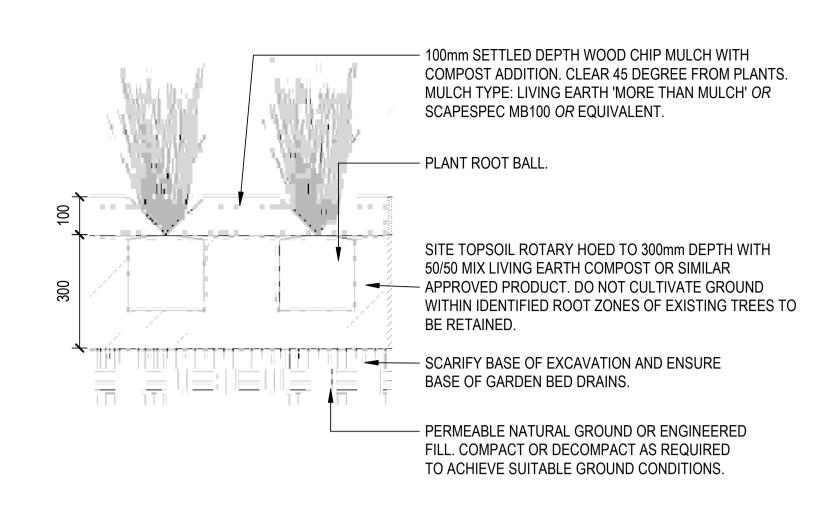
DETAIL - TYPICAL AMENITY PLANTING UNDER EXISTING TREES DETAIL
